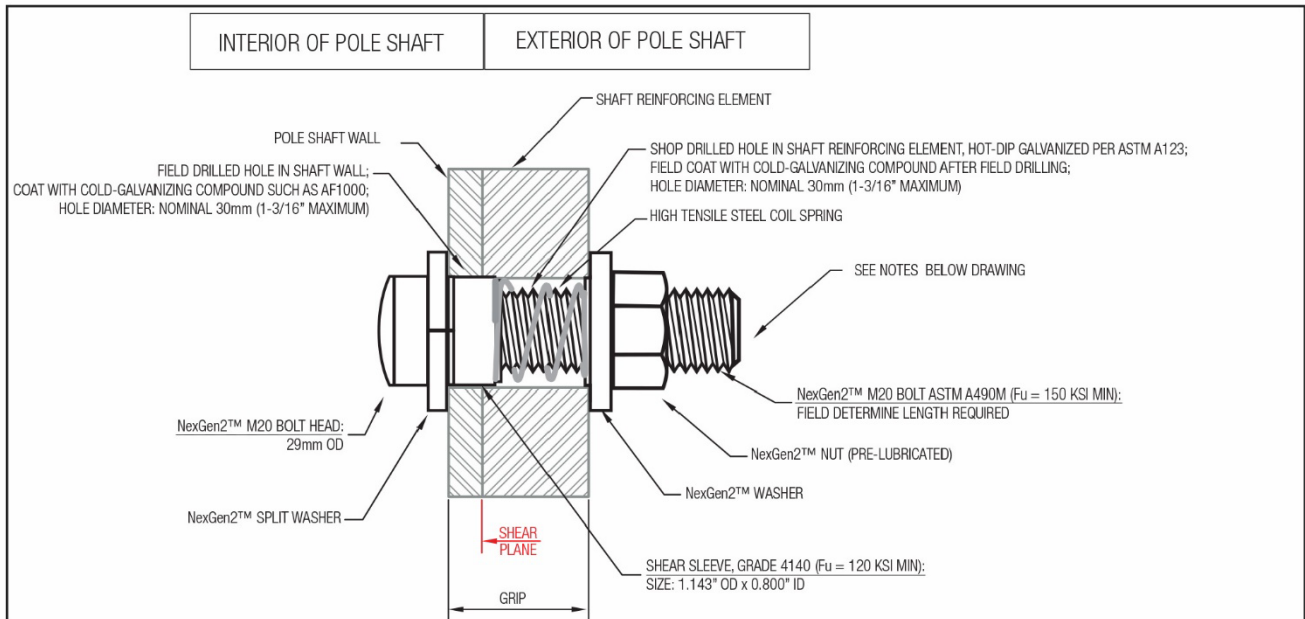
NEXGEN™ ONESIDE BLIND BOLT INSTALLATION DETAILS
